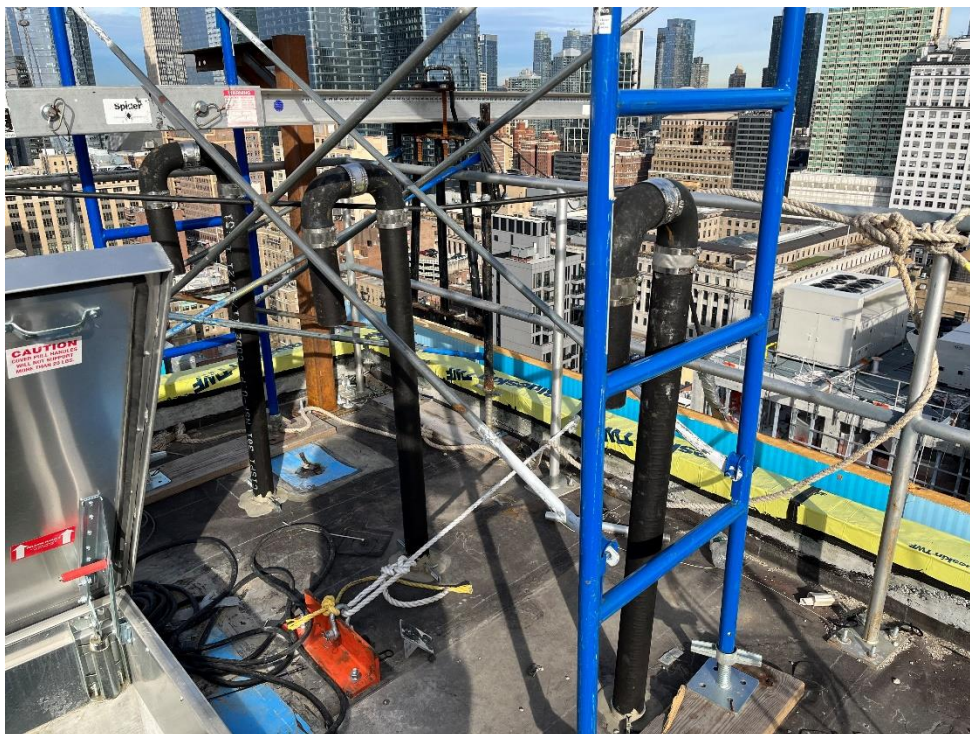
, 01/17/2023: View of SMD exhaust pipes on the southern tower building roof (facing northwest)
